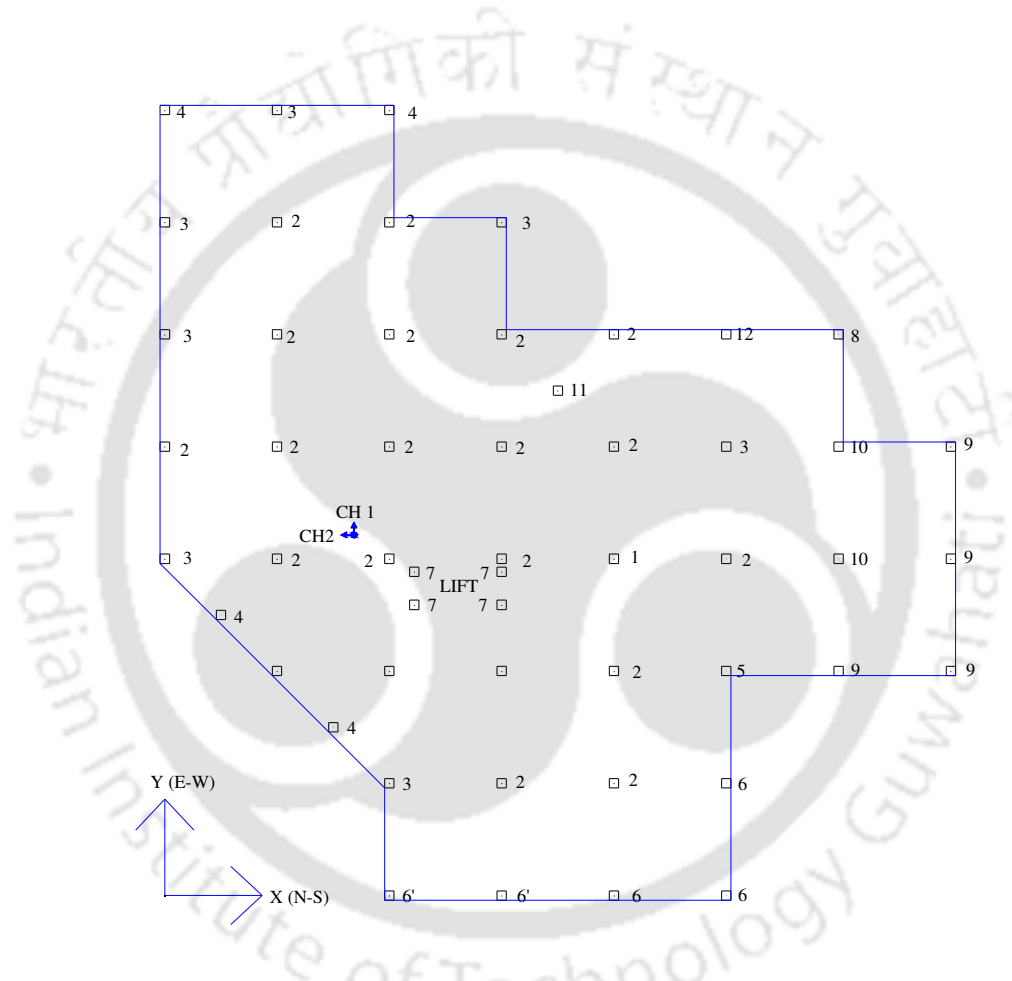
Plan showing column position and sensor location in the ground floor of torsionally coupled sample building
